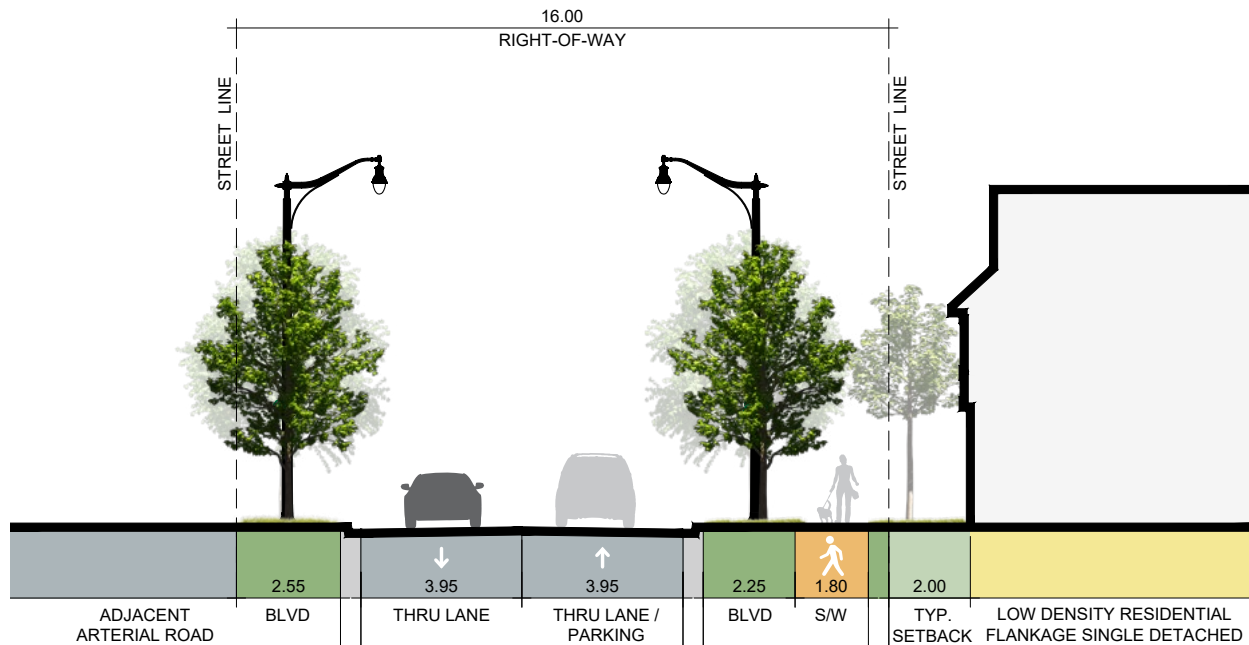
Proposed 16.0m Window Street ROW Cross Section
